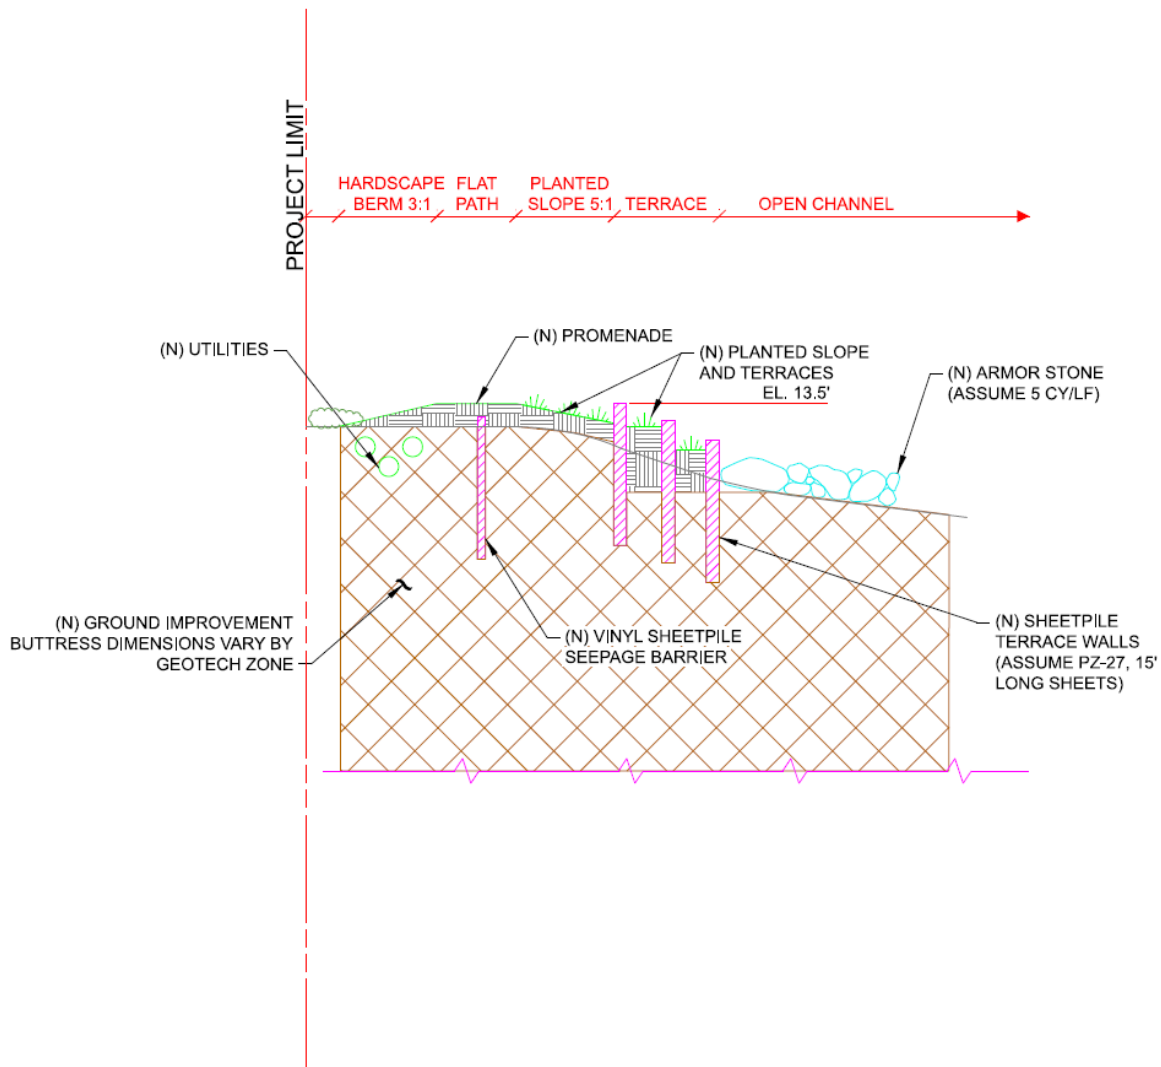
Section 6 Recommended Plan (Reach 3, South Beach Wharf)
